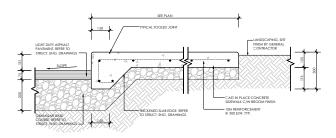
TYPICAL SIDEWALK CURB DETAIL
